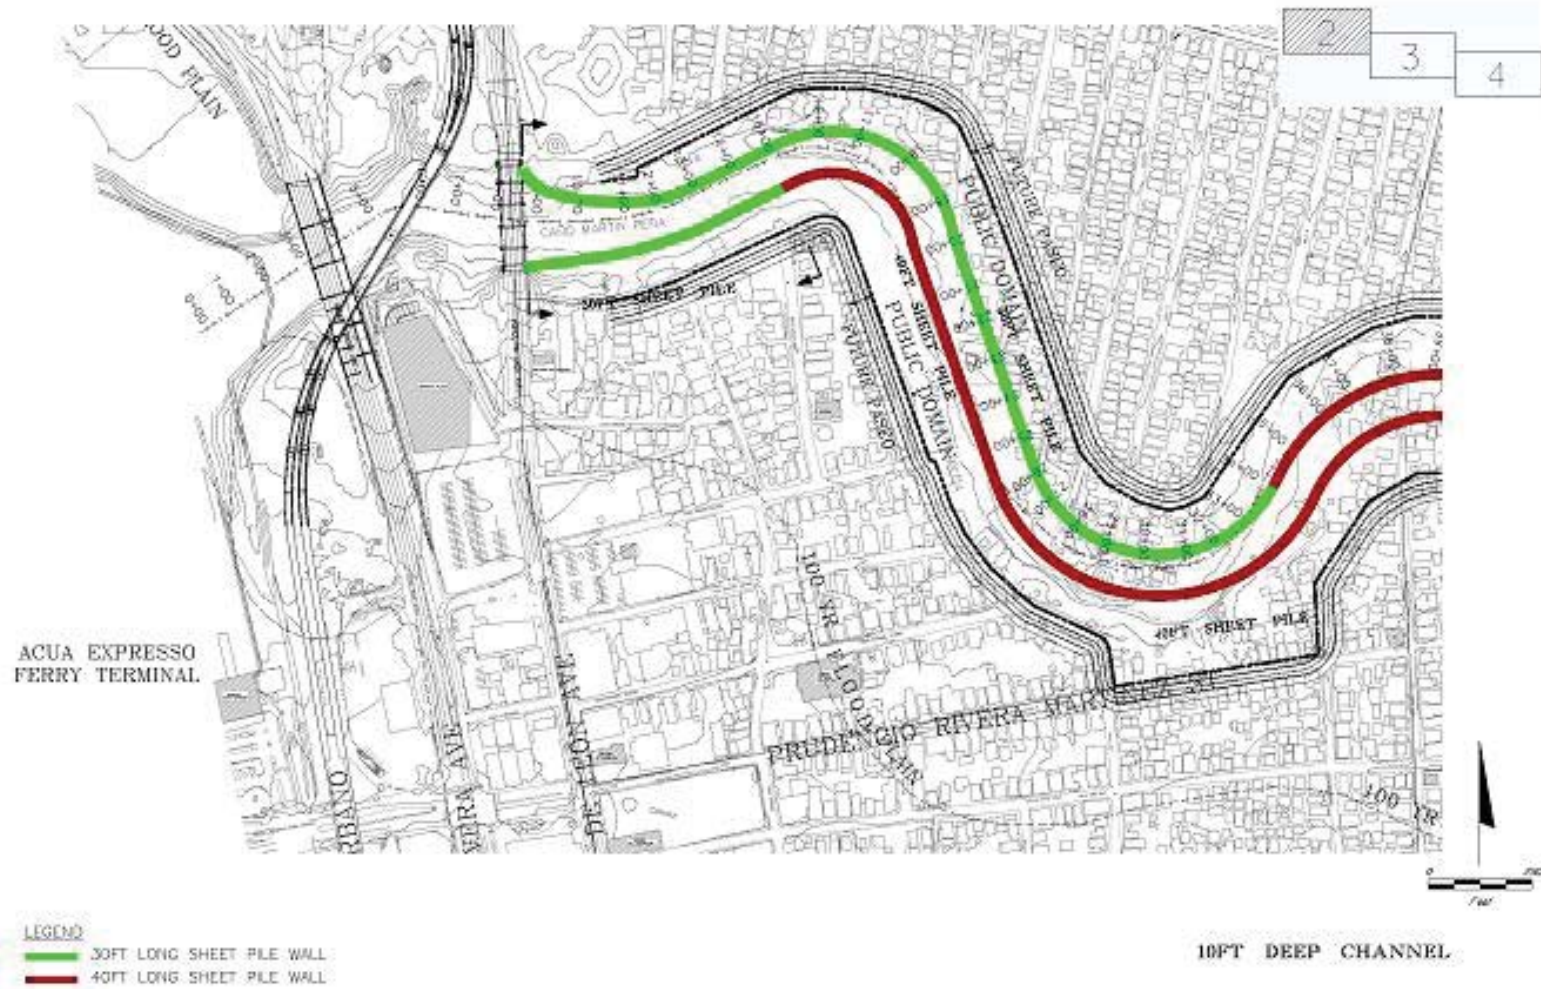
Sheet Pile Wall Layout, 10-foot-deep Channel
